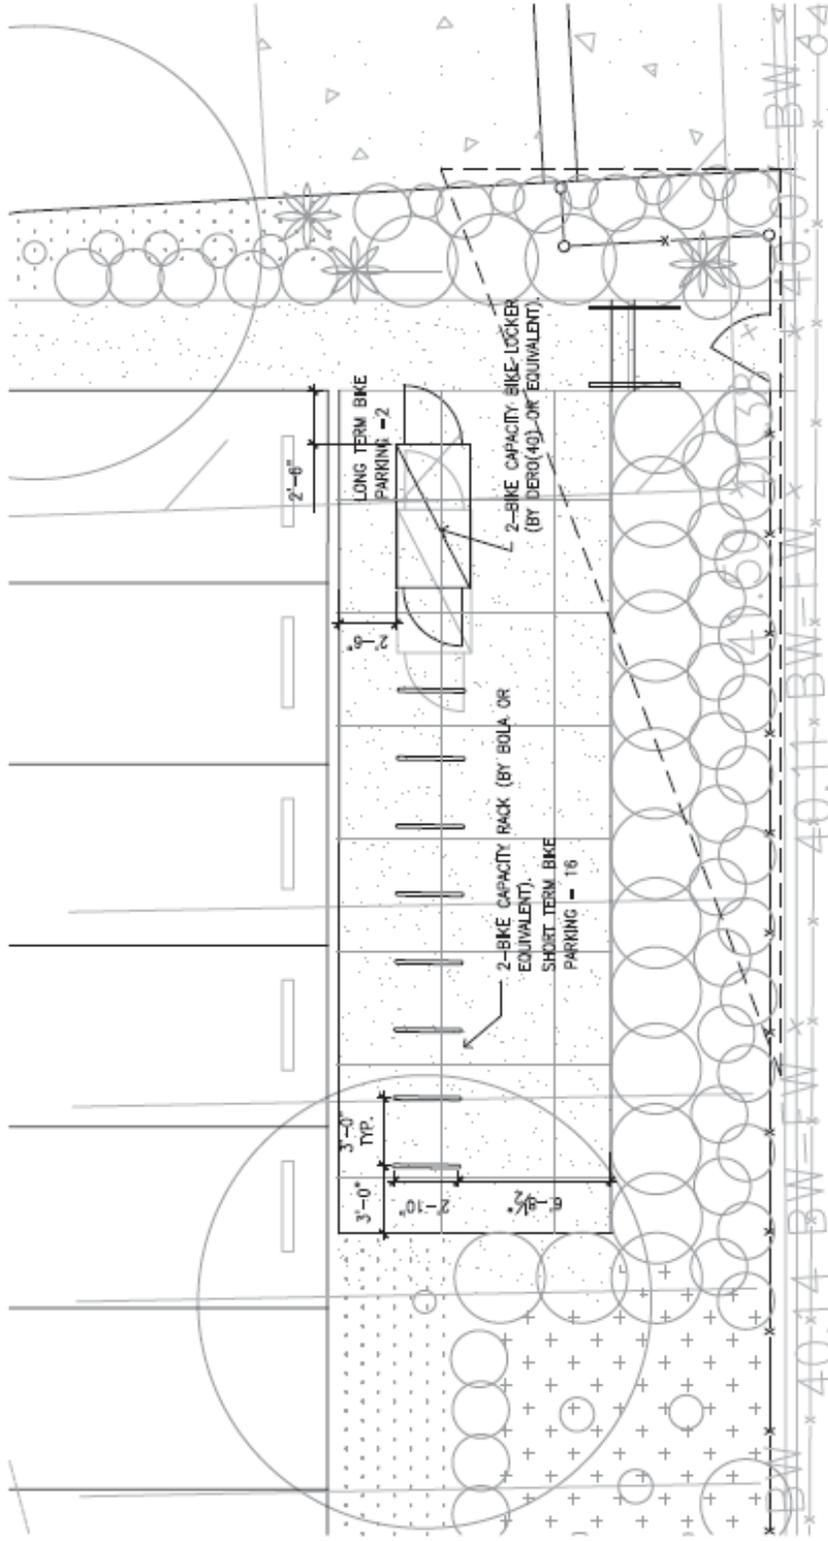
Medical Office Site Bicycle Parking Facilities Detail
